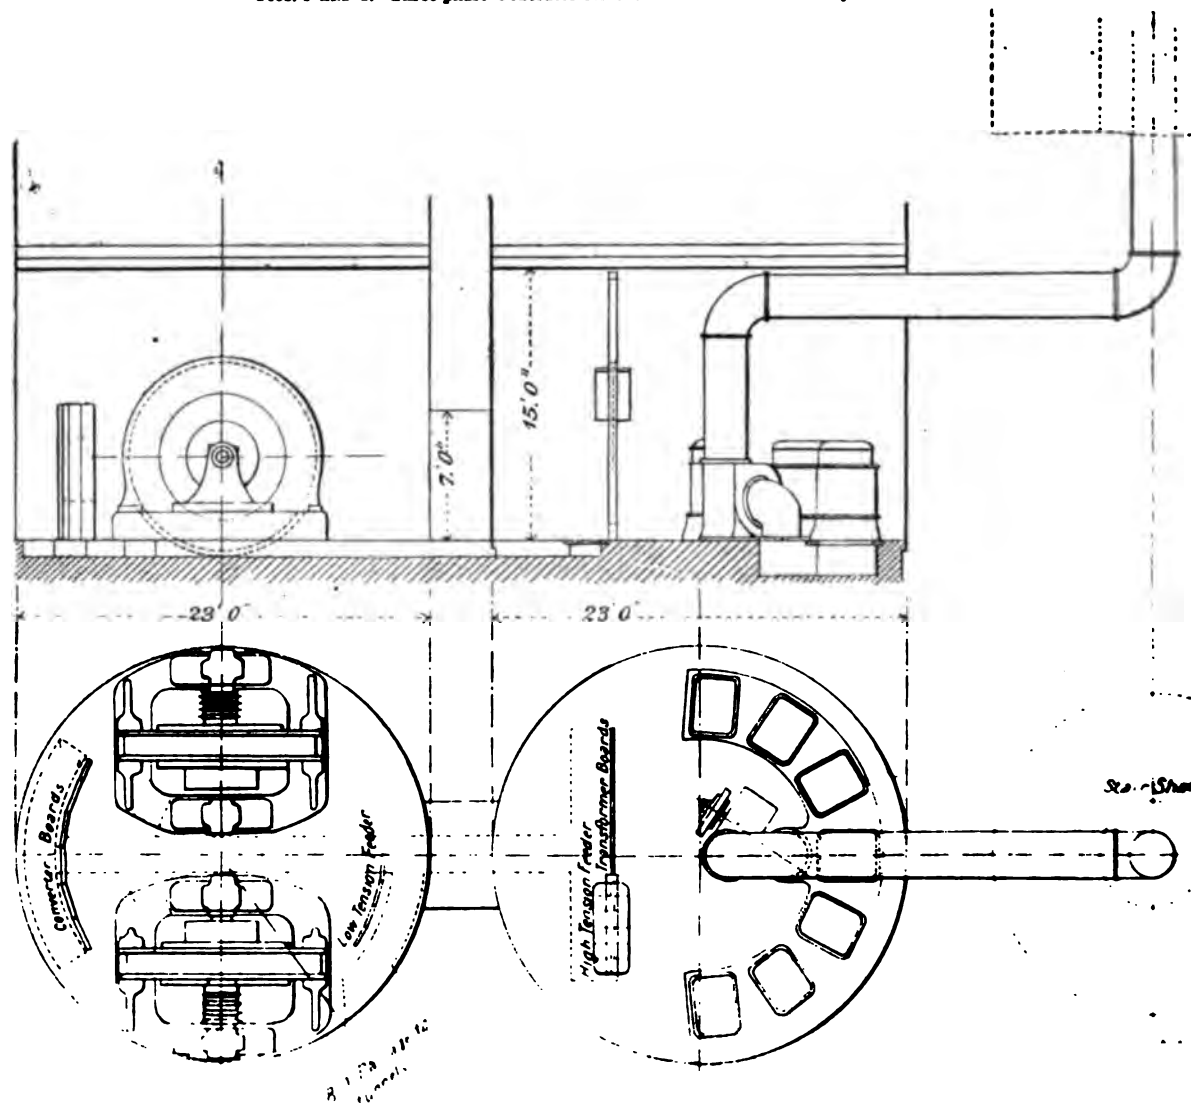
Arrangement of Sub-Station Plants on the Central London Railway.
